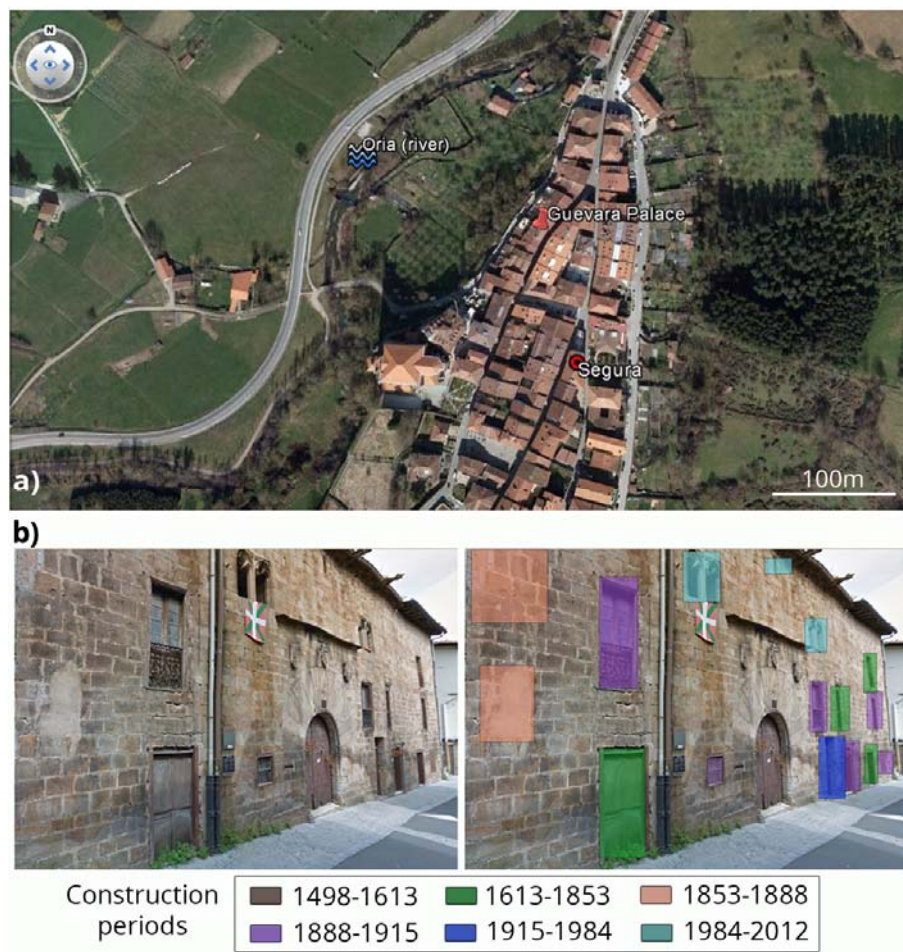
a) Geographic location of the studied historical building (Guevara Palace House, Segura, Basque Country, North of Spain). b) Architectural study of corresponding construction periods of the building facade.
